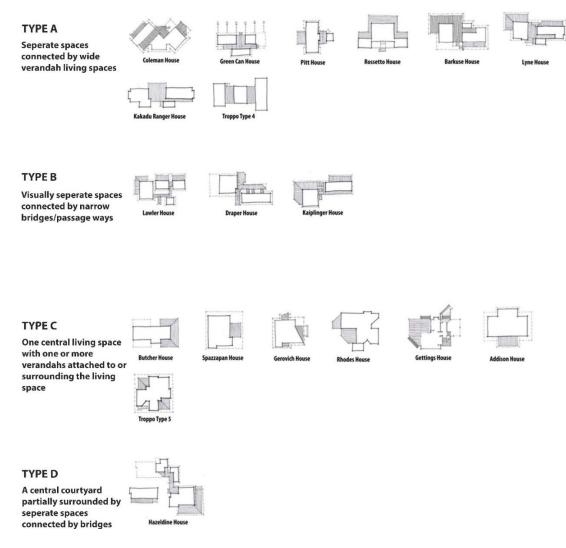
4 types of floor plans (A, B, C and D²²⁸) are identified in terms of the configurations of spaces and their connection with nature through verandah, bridges and passage ways.
